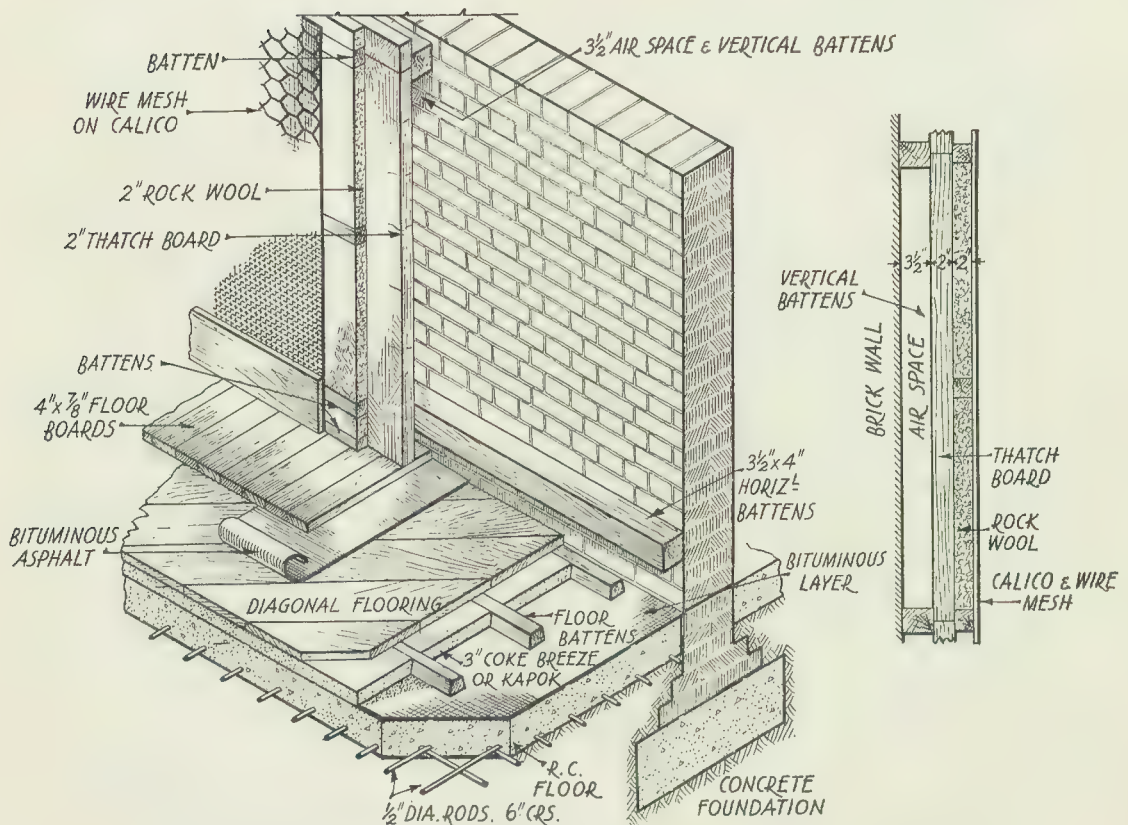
SOUND-PROOFING BRICK WALL AND CONCRETE GROUND FLOOR
